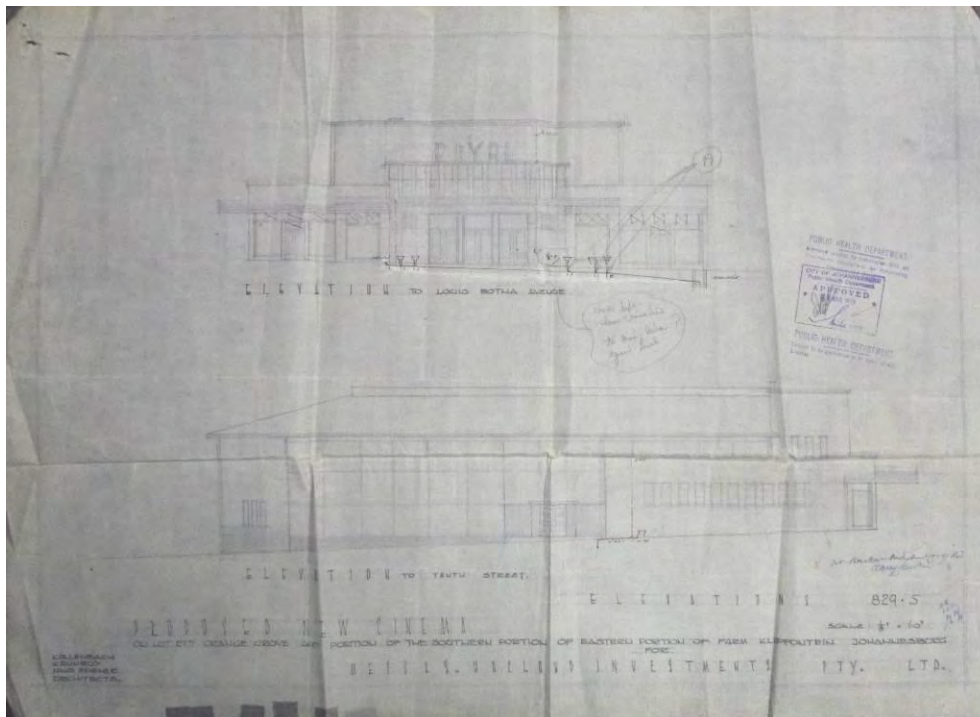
Original plan from 1939 showing proposed new cinema on Stand 277 & Port. 5 of E on the corner of Tenth Street and Louis Botha Avenue, Orange Grove
